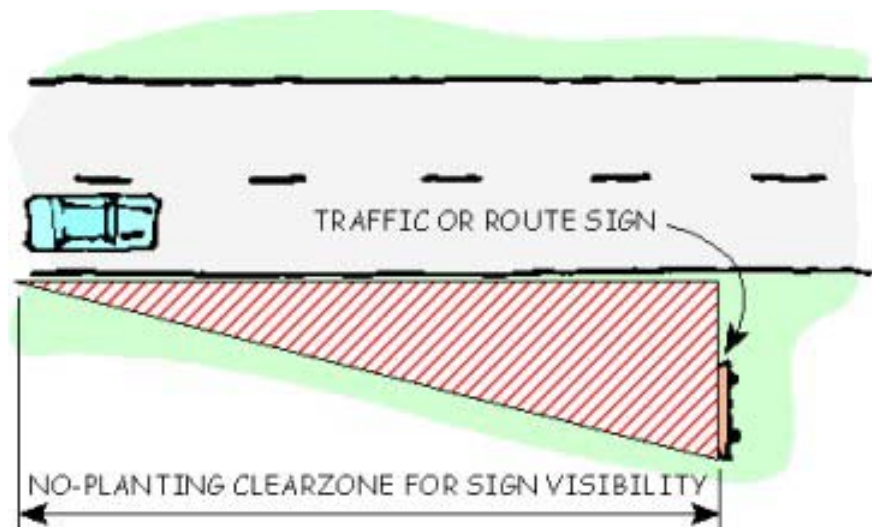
Plants must not be placed where they may obstruct any sign.
